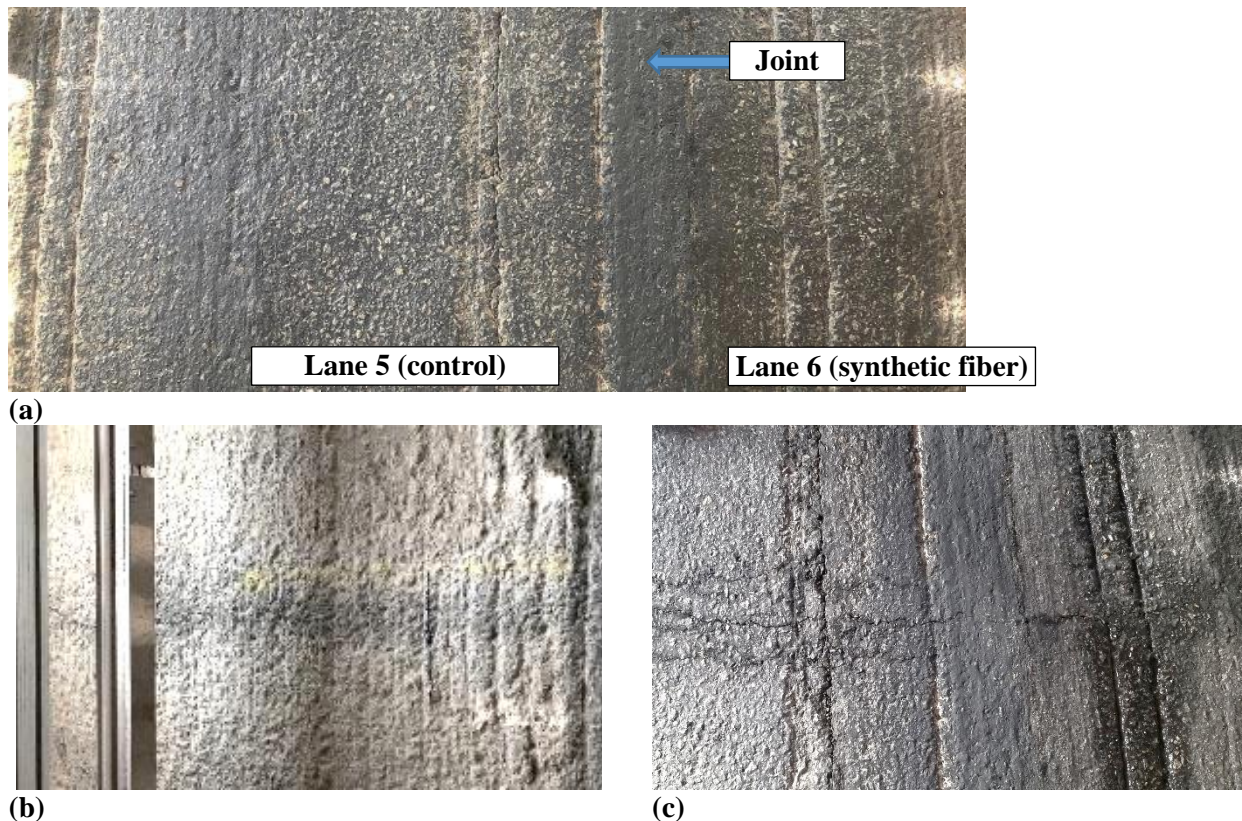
(a) Top view of Lane 5 and 6. (b) Crack on Lane 5. (c) Crack on Lane 6.
